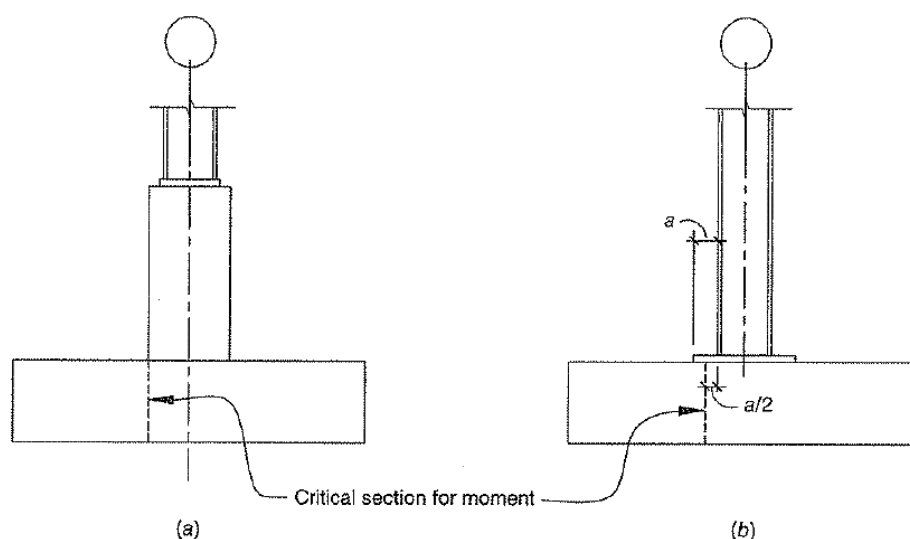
Critical sections for flexure in isolated footings: (a) Steel column bearing on a concrete pedestal supported by a footing; (b) steel column bearing directly on the footing.
